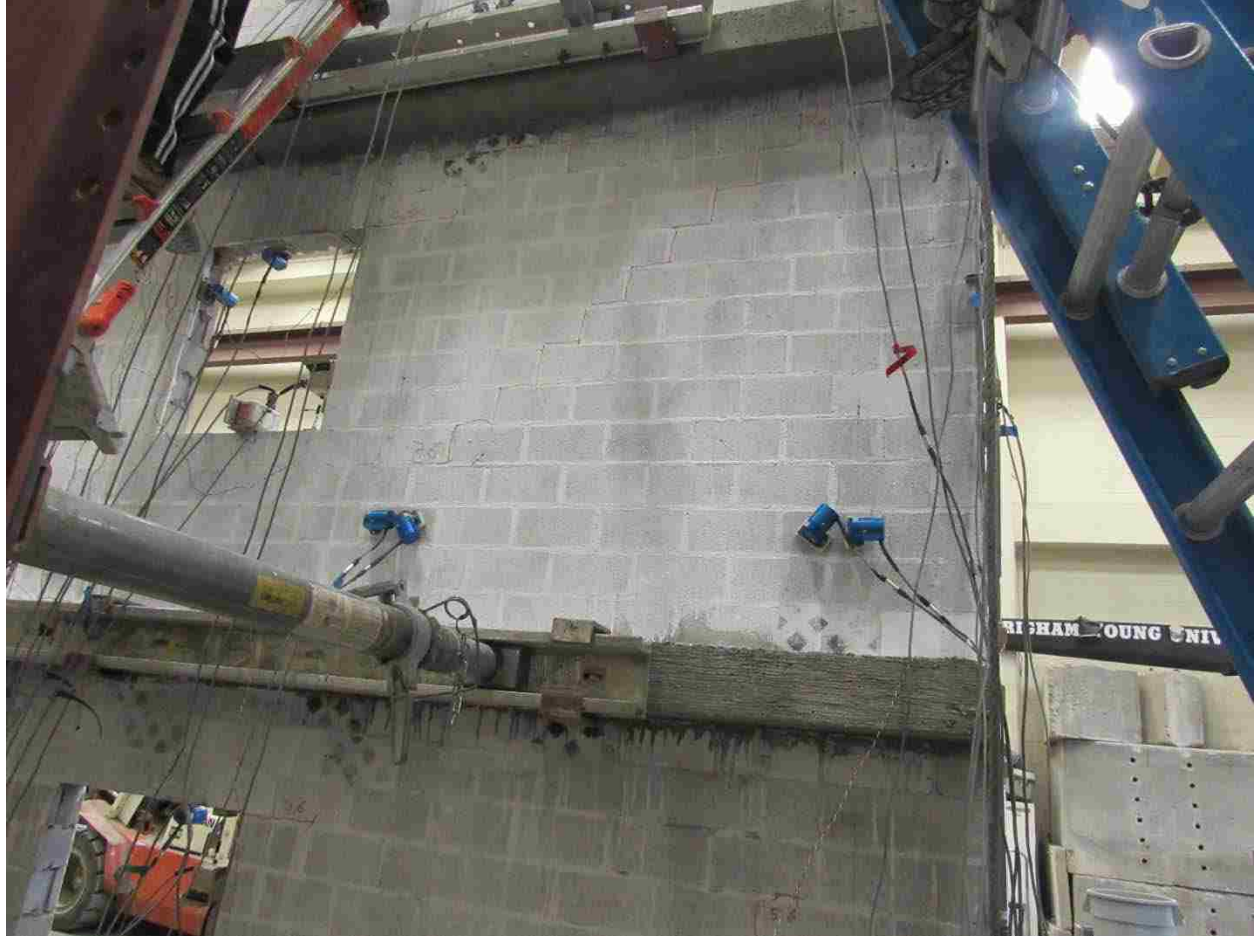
Enlarged view of 2nd story cracks in pull regime
